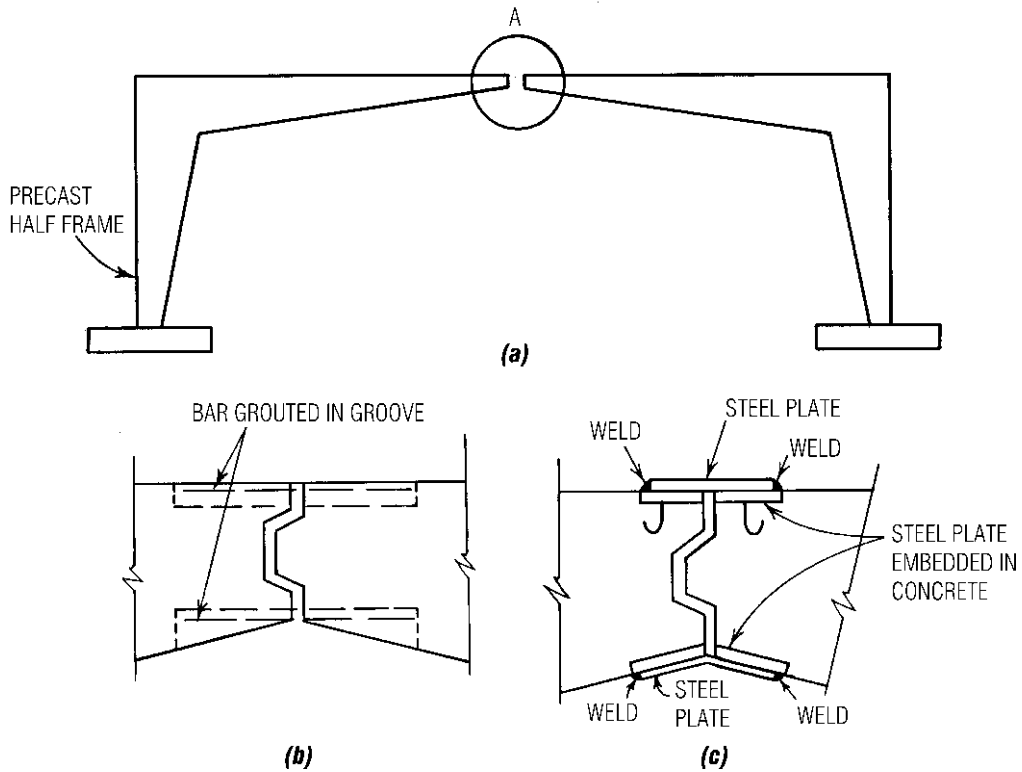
Precast-concrete rigid frame. (a) Halves connected at midspan. (b) Midspan joint with grouted longitudinal reinforcing bars. (c) Welded connection at midspan.
